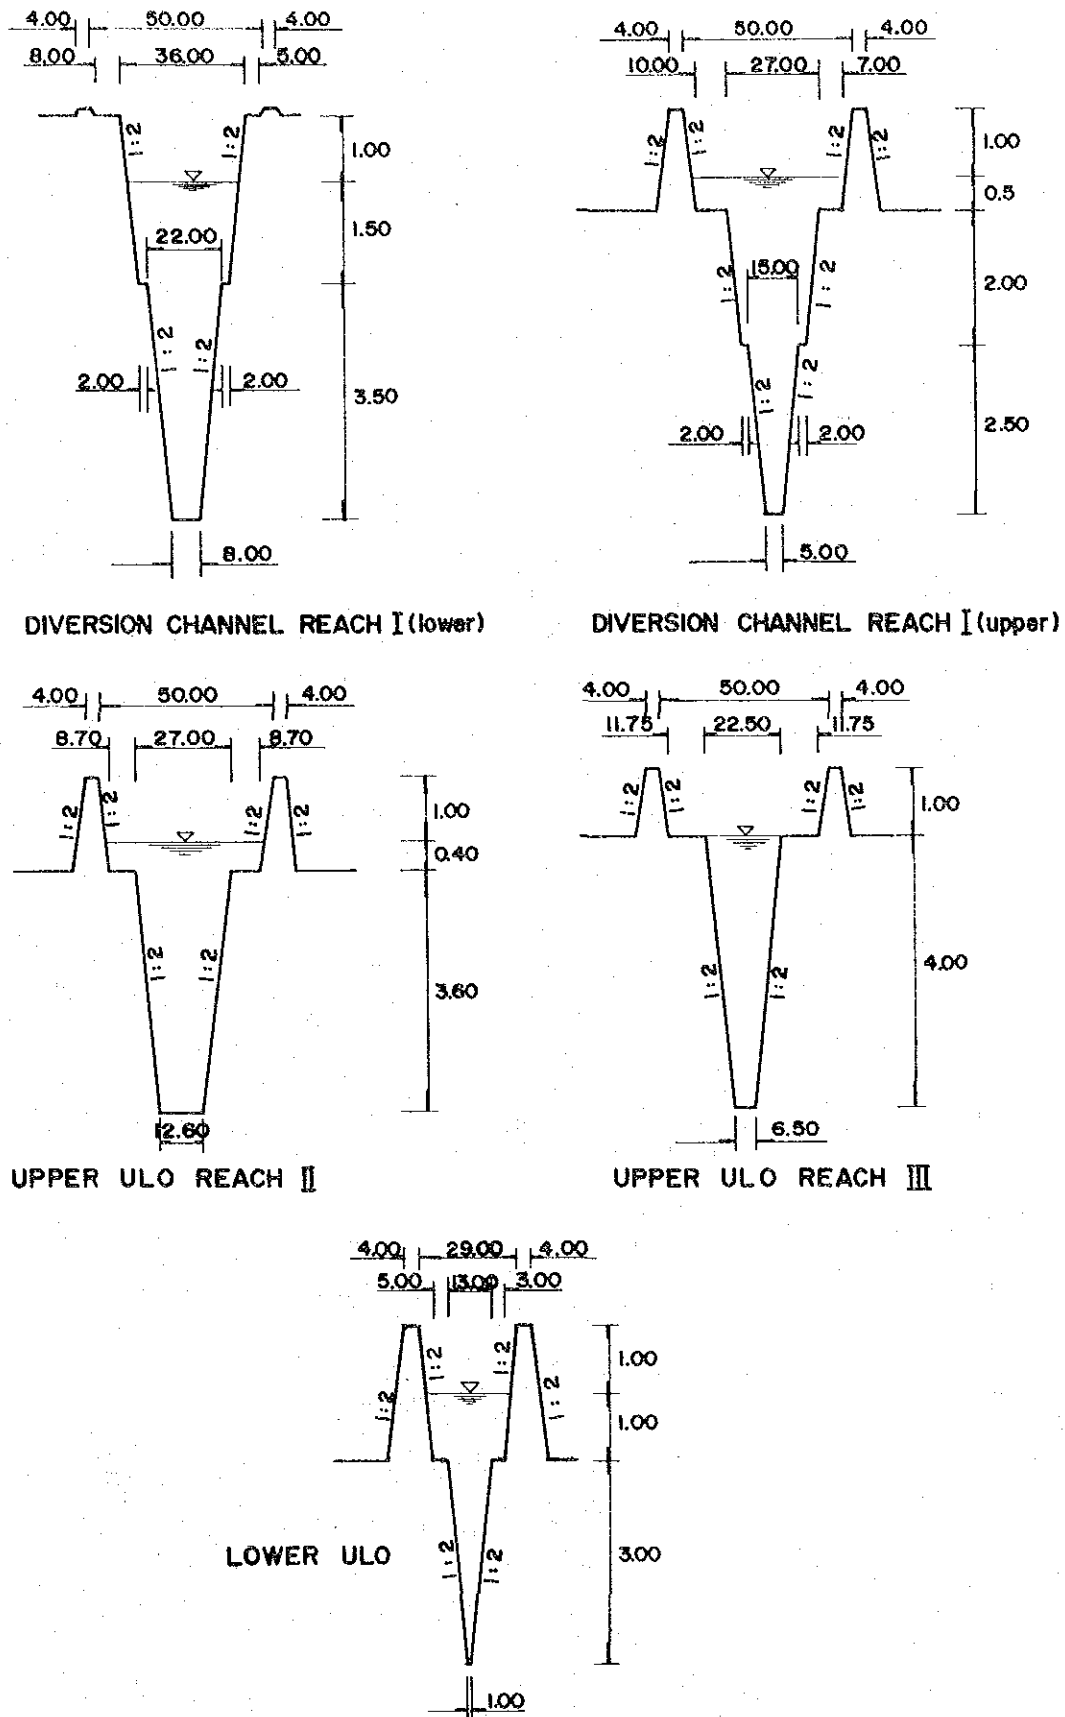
TYPICAL RIVER CROSS-SECTIONS FOR FIRST STAGE PLAN (4/6)
